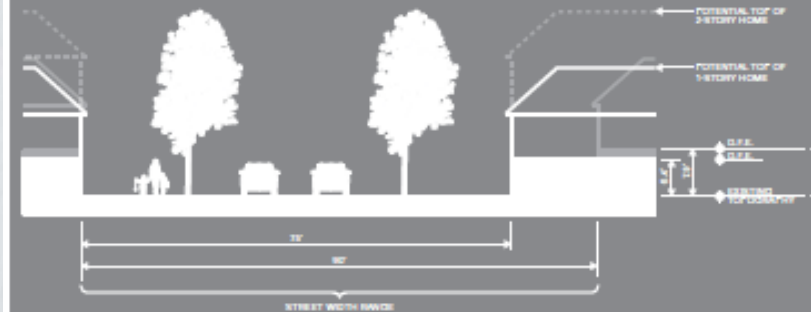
Street Section Typologies. Typical sections based on Neighborhood Character Types.
